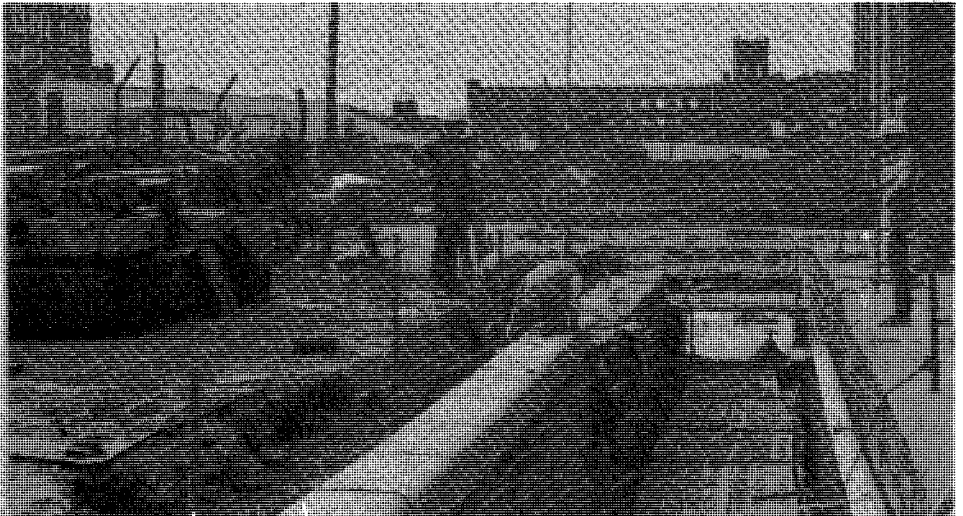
Lock 2 west. The towpath side wall (left on the picture) has been rebuilt and the copings are being put in place. Plantation Street bridge (below the lock) had been widened when the canal was closed under a licence granted by the Waterways Board to Senior Service, whose factory can be seen on the left. In co-operation with Tameside Canals, the company have employed Dews of Oldham to reduce the width of the bridge sufficiently to allow lock-gates to be fitted again. The lockside parapet wall of the bridge had been demolished and the concrete bridge deck reduced in width when this photo was taken. Dews had installed a new bywash pipe under the road (seen on the right).
